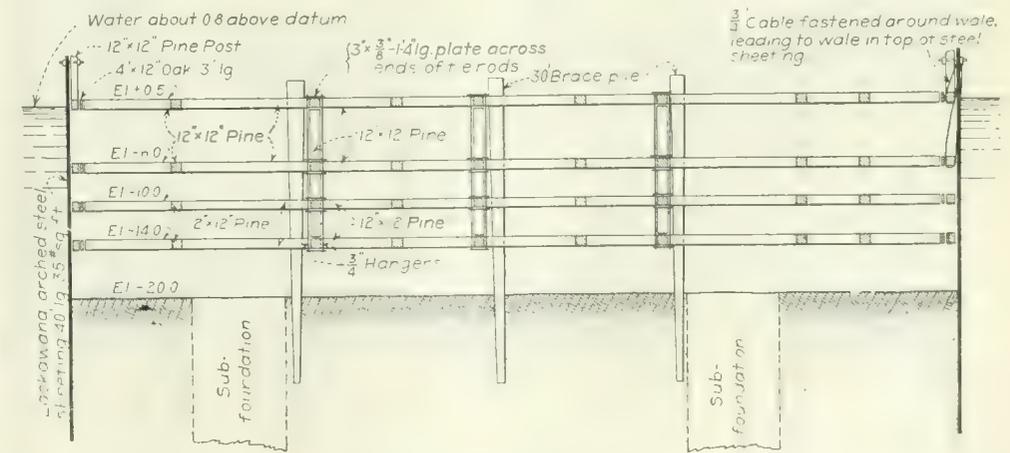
Typical Cross Section of East Cofferdam for Chicago Ave. Bridge, Showing Bracing and Central Brace Piles.
